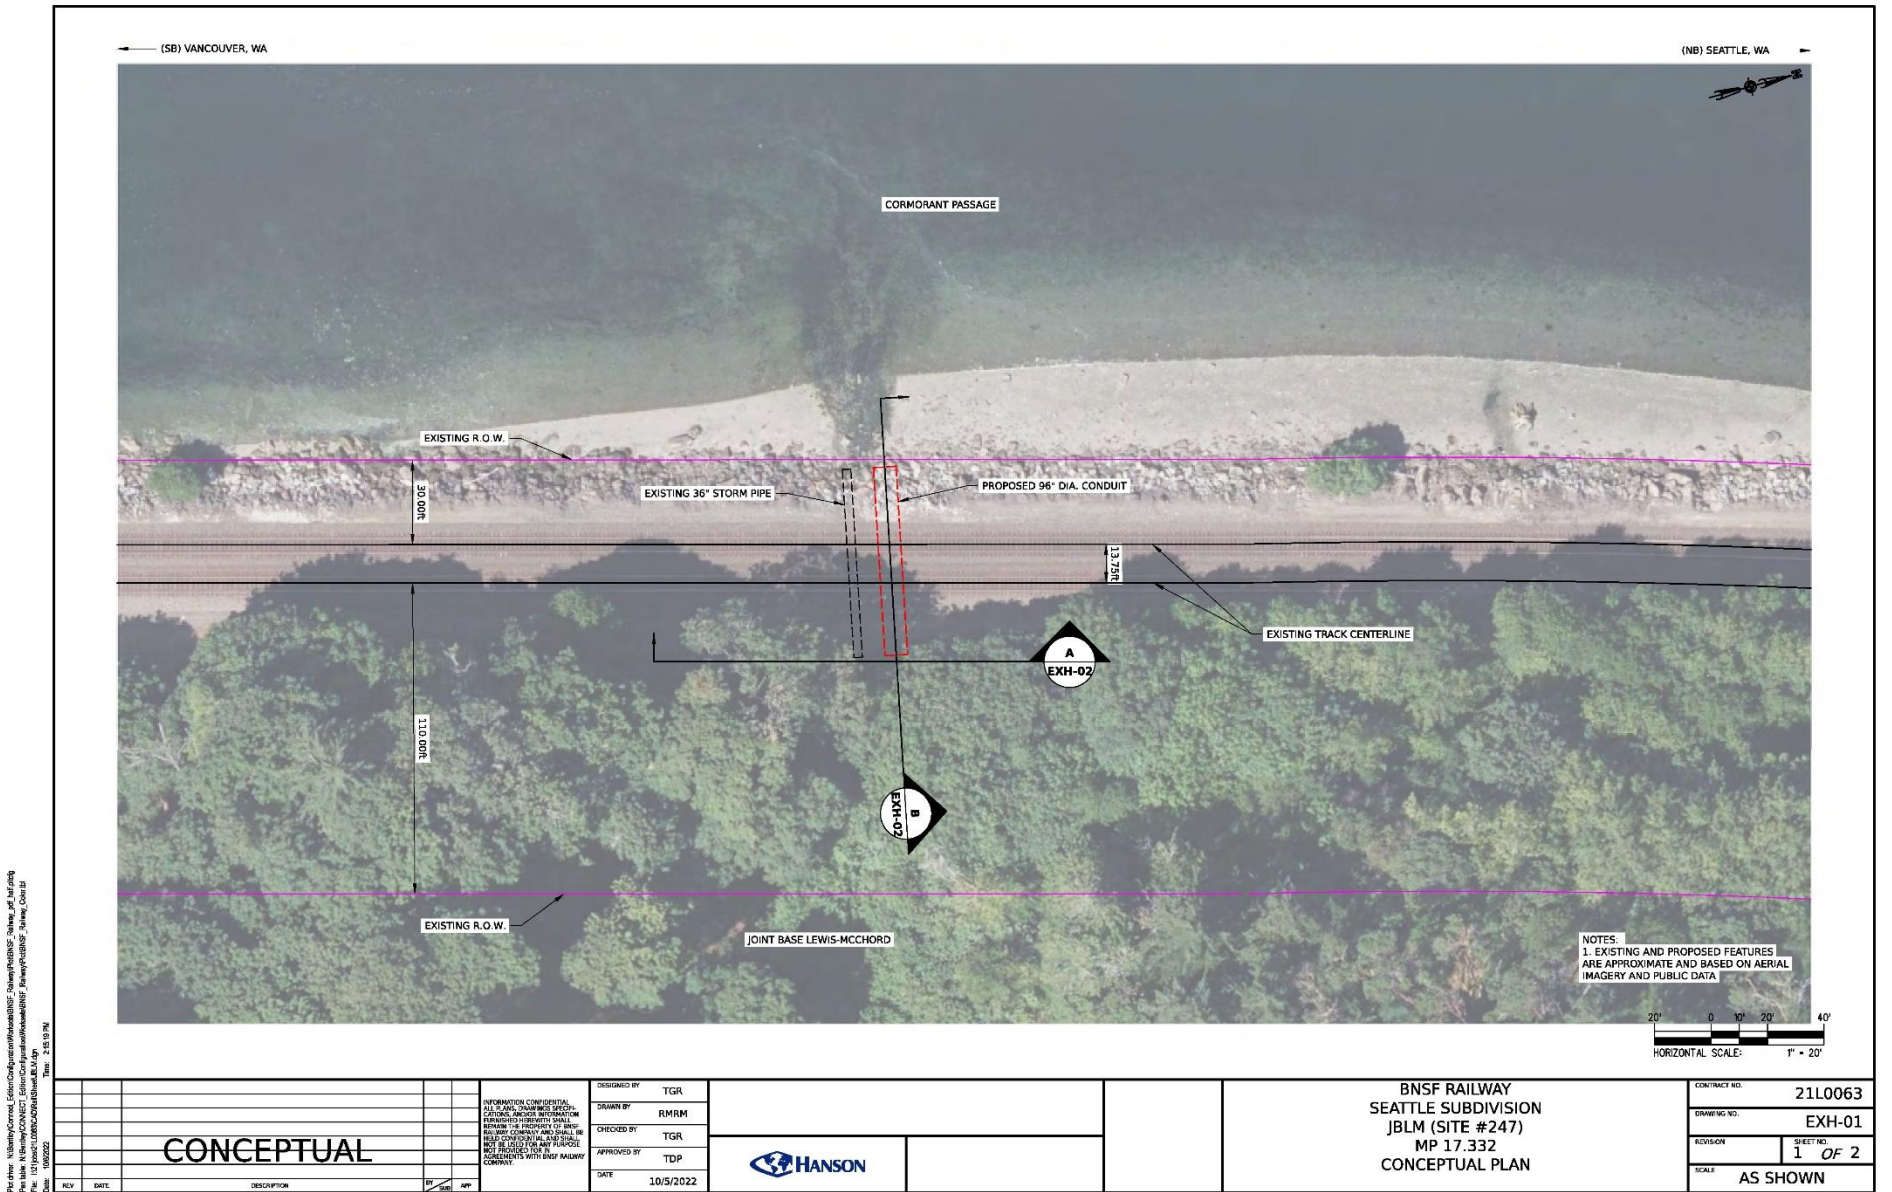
Conceptual Engineering Plan View of Replacement Culvert Under Railroad Tracks at Unnamed Creek on JBLM
